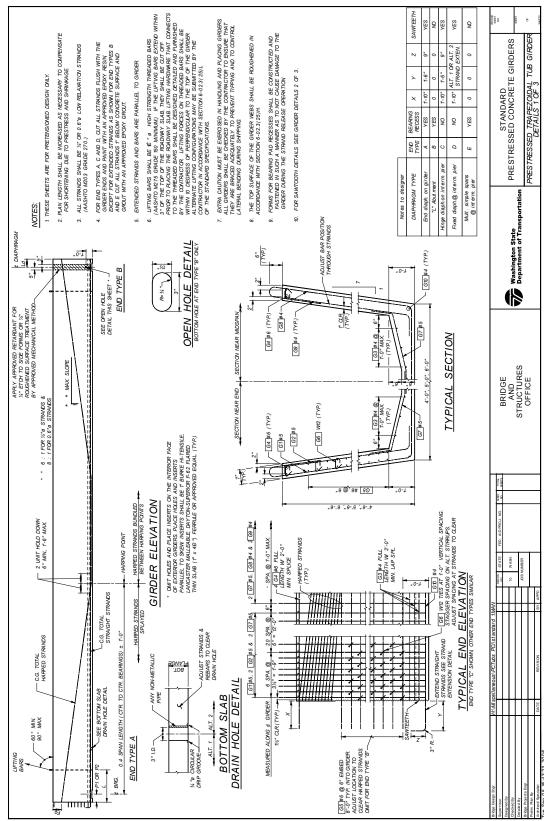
Standard Drawing for Trapezoidal Tub Girder, 1 of 3
